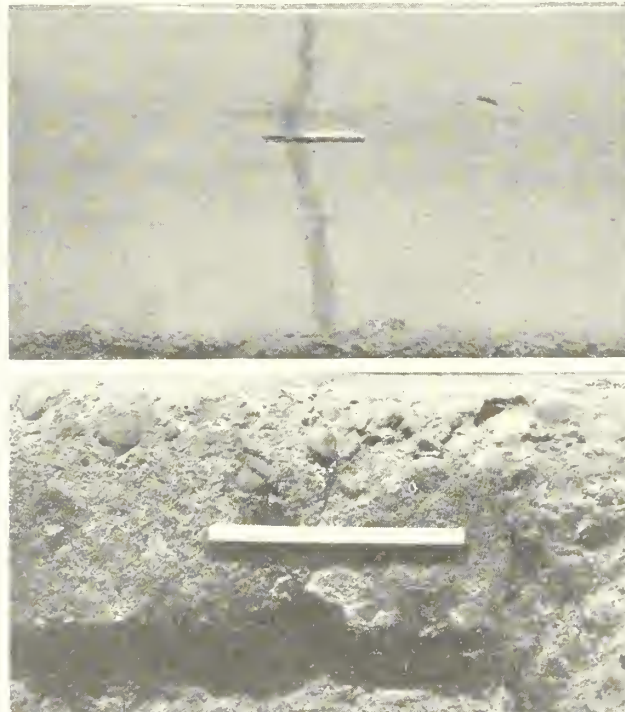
TYPICAL CRACK IN A HEAVILY REINFORCED SECTION OF THE COLUMBIA PIKE EXPERIMENTAL PAVEMENT AFTER 18 YEARS OF SERVICE. UPPER, SURFACE OF PAVEMENT; LOWER, EDGE OF SLAB.
